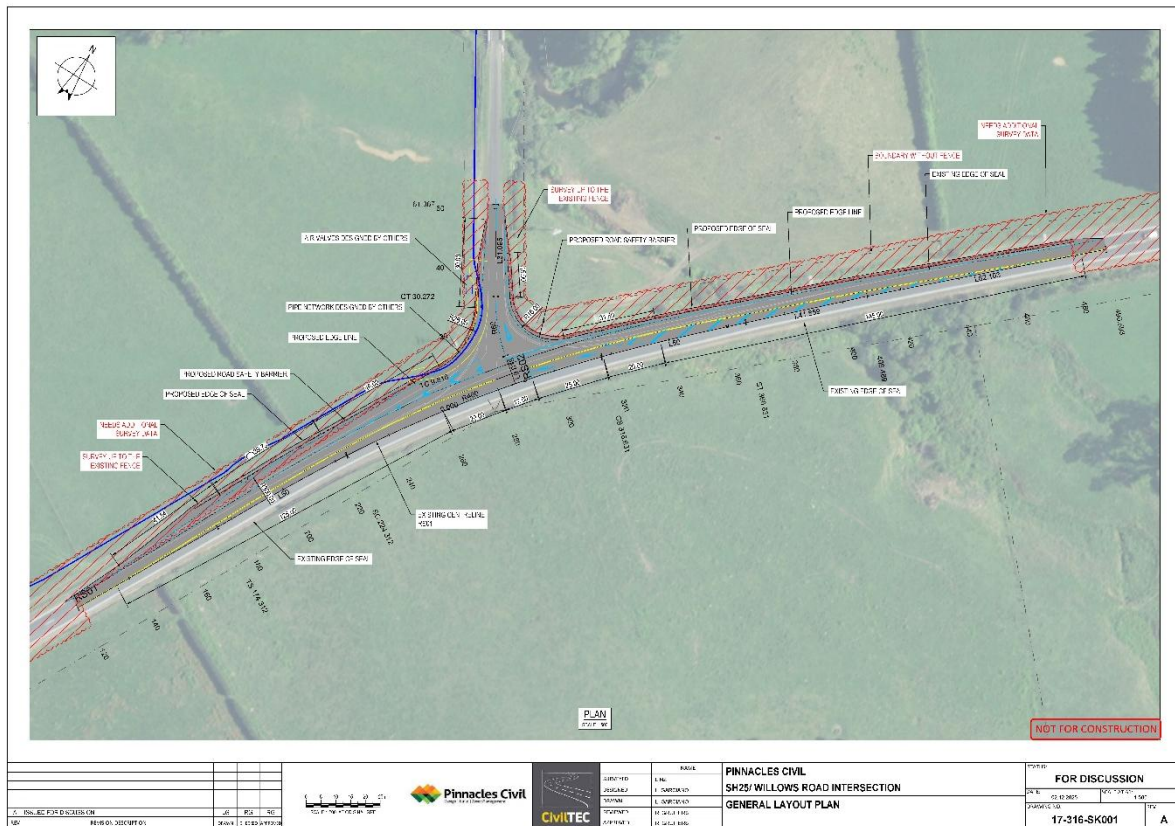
SH25 / Willows Road Intersection Upgrade Preliminary Design
